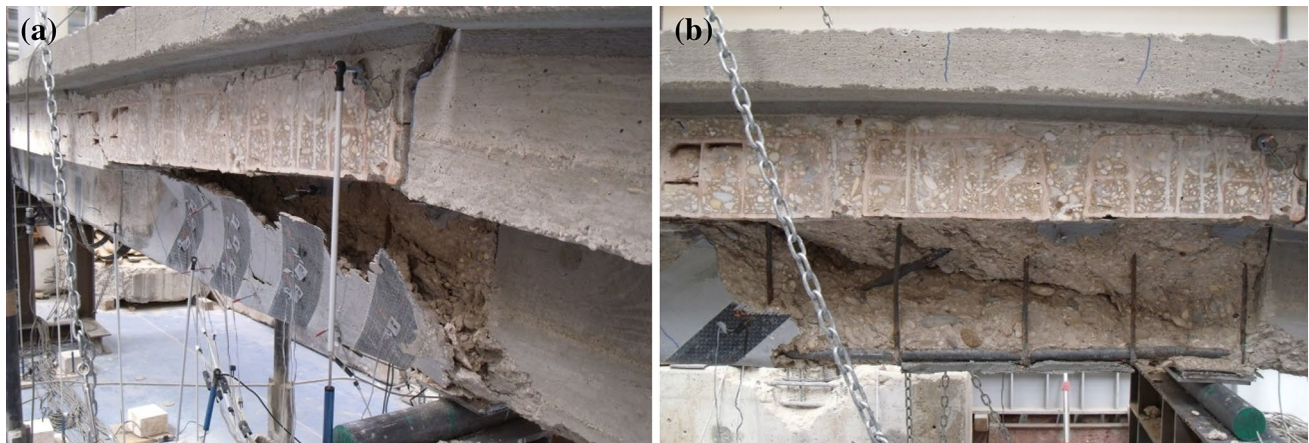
Retrofitted beam S-TM2 without retrofitting construction defects: damage after the failure test a debonding of C-FRP strips; b concrete principal diagonal crack
